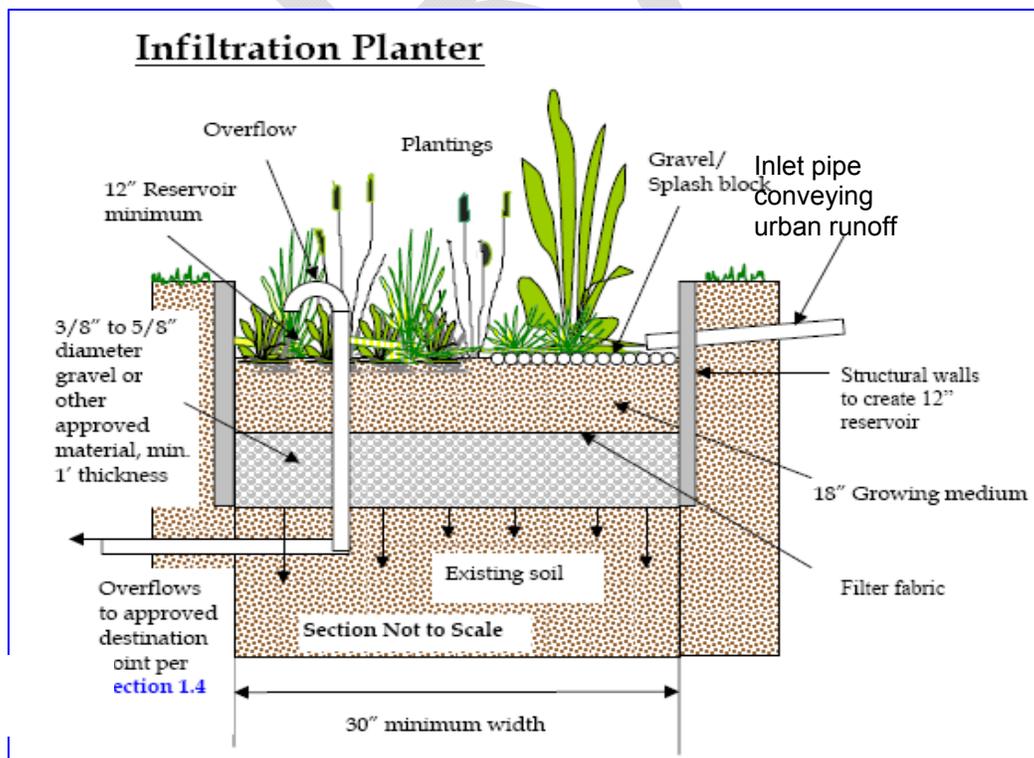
Schematic of a Stormwater Planter that Receives Urban Runoff from a Pipe, Drains Directly to Underlying Soils, and Overflows to the Conventional Storm Drain System via an Overflow Pipe (adapted from Portland BES)
